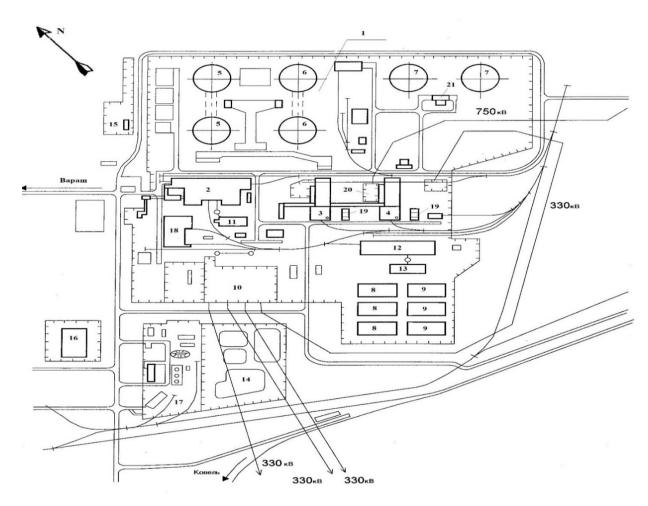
Schematic layout of buildings and structures at the SS Rivne NPP industrial site
